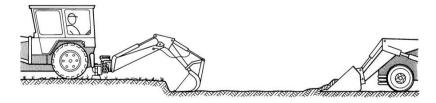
Clearance of topsoil over area of building before the foundations are excavated.
